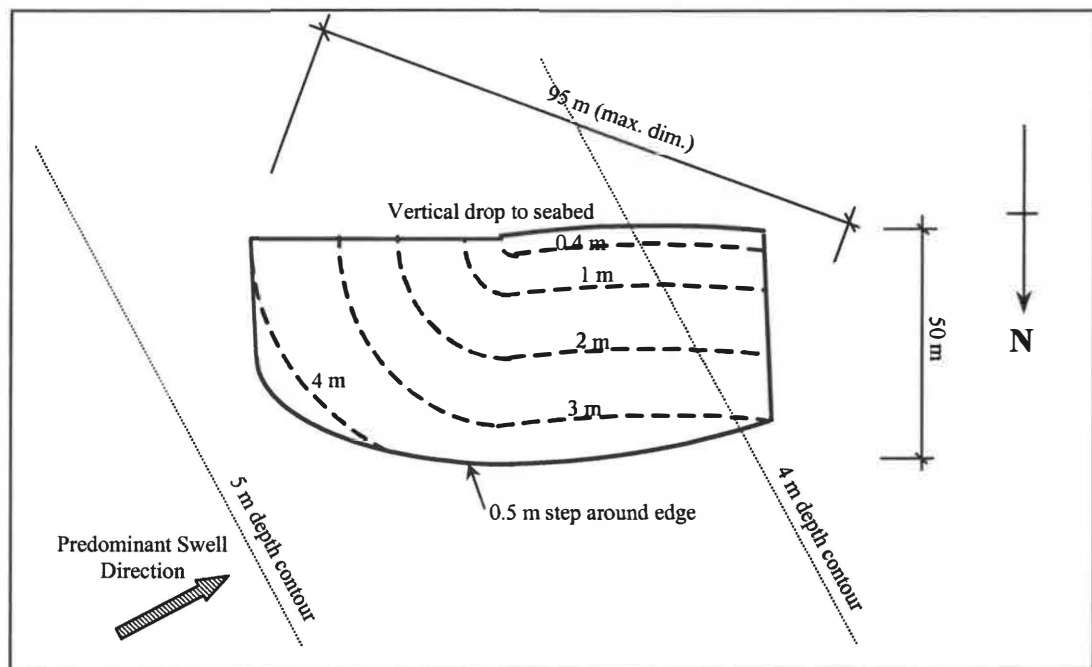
Plan view of proposed ARP reef at Tay Street, Mount Maunganui, New Zealand. (Approximate scale 1:500).
